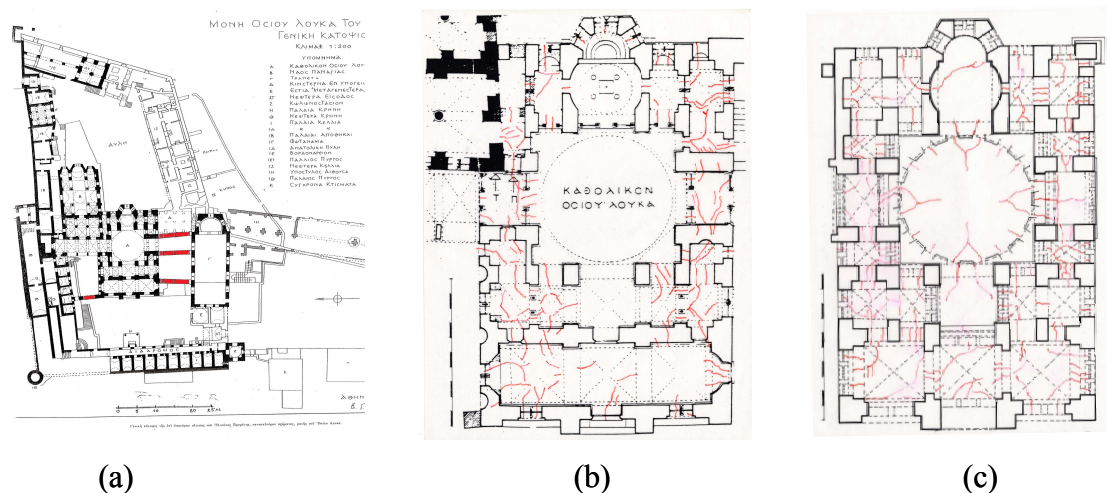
(a) General plan of the Katholikon and adjacent structures (Stikas, 1970) and crack pattern on the intrados of the vaulted roof of the ground floor (b) and of the gallery (c)
